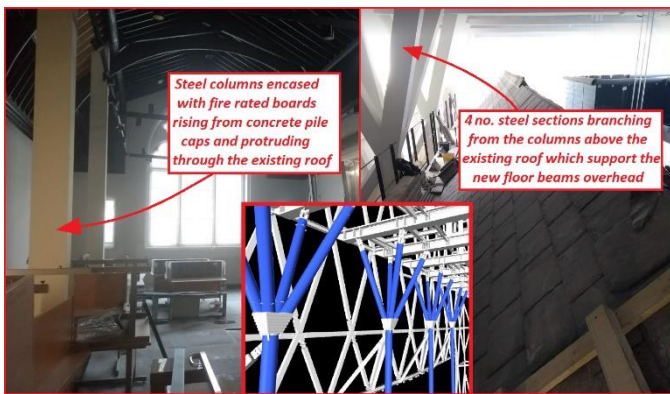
Views of encased steel columns within the existing Church Hall (LHS) which branch off above the slated roof to support new floor beams overhead (RHS) – photos by author.
